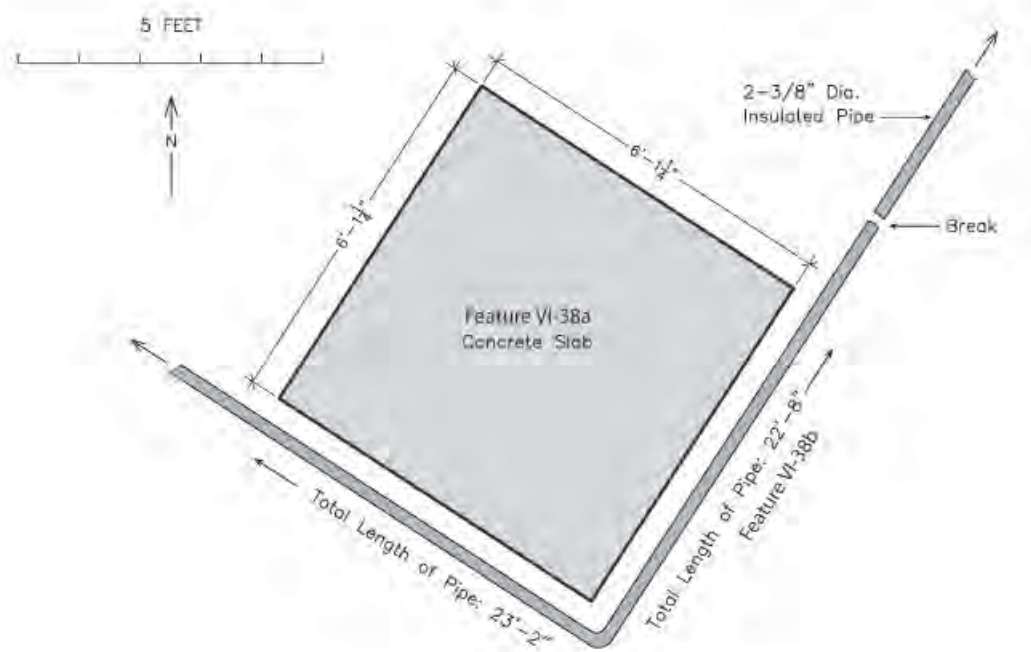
Feature VI-38, concrete water heater building foundation.
